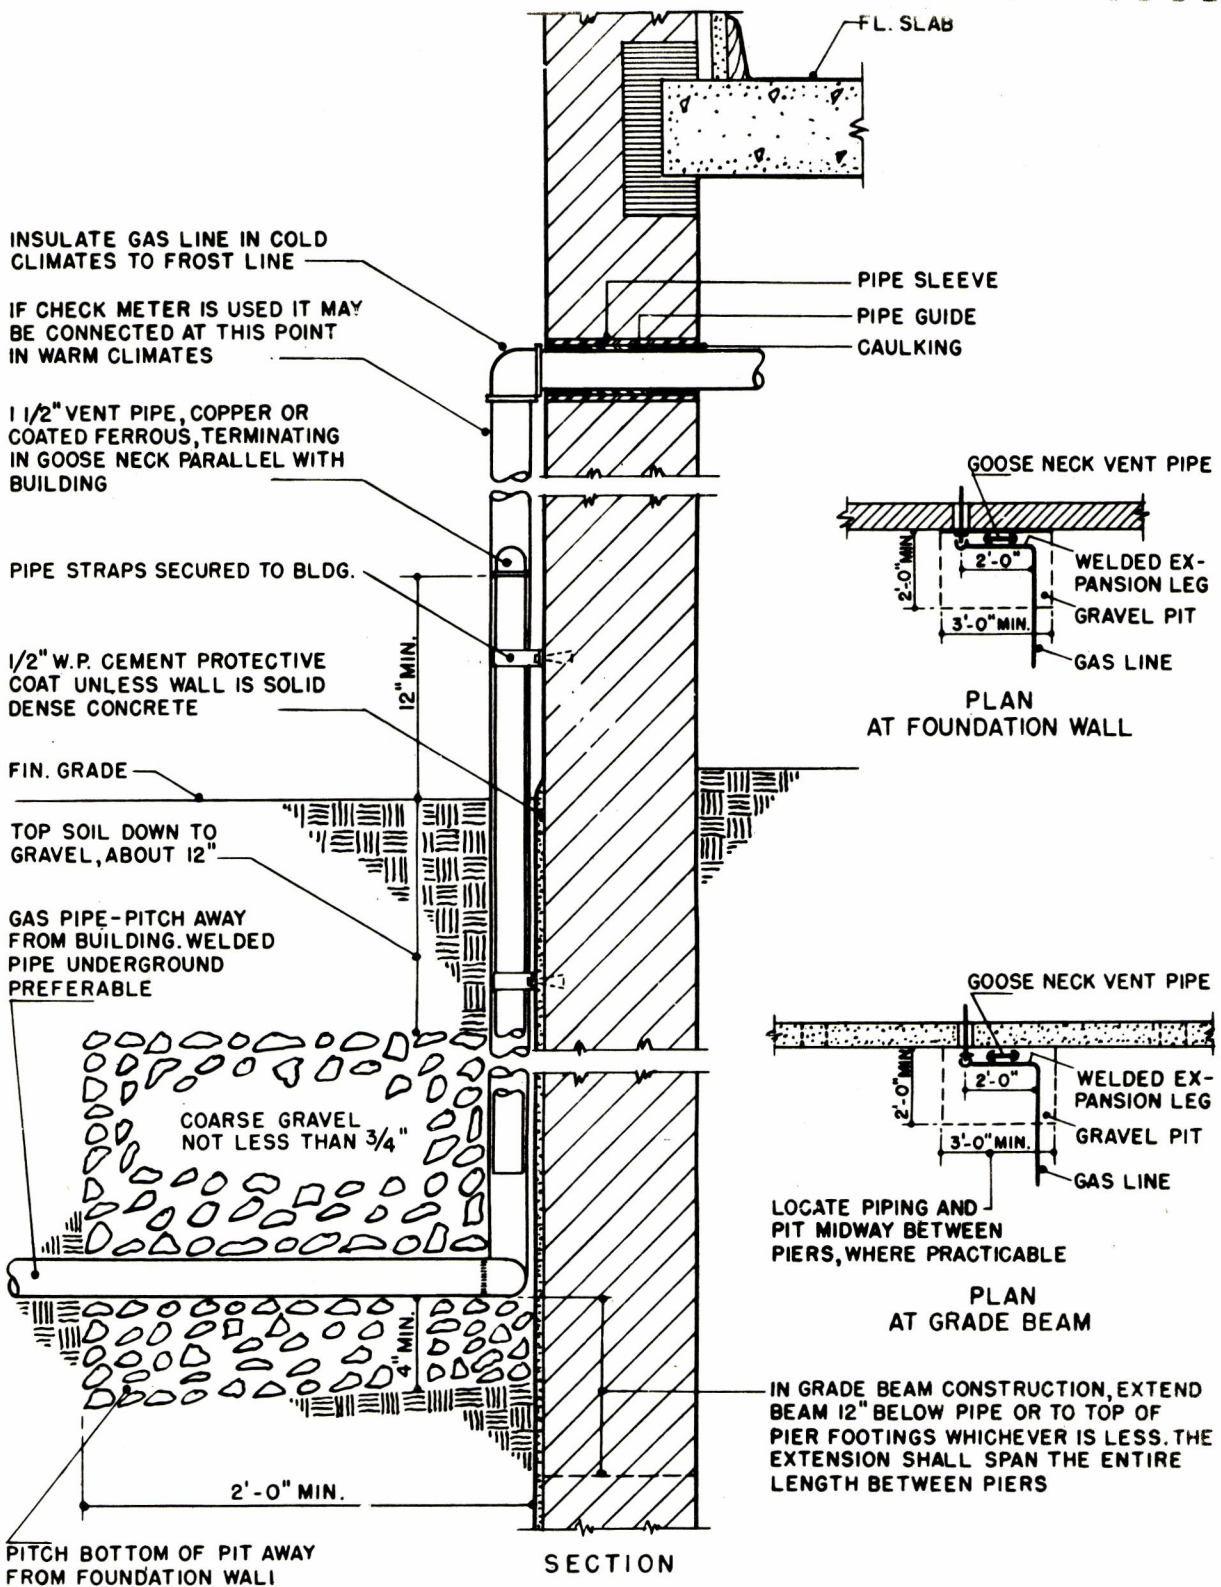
METHOD OF VENTING GAS PIPE TRENCH AT BUILDING ENTRANCE WITH CRAWL SPACE CONDITION - 1. WITH CONTINUOUS FOOTING CONSTRUCTION. 2. WITH GRADE BEAM CONSTRUCTION
